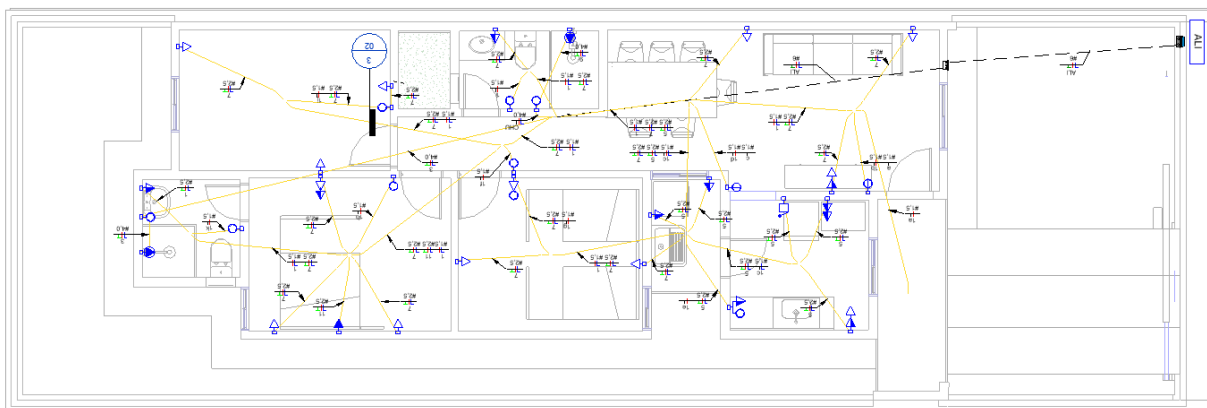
Old electrical design - floor plan. Source: Cipresa, 2018.
